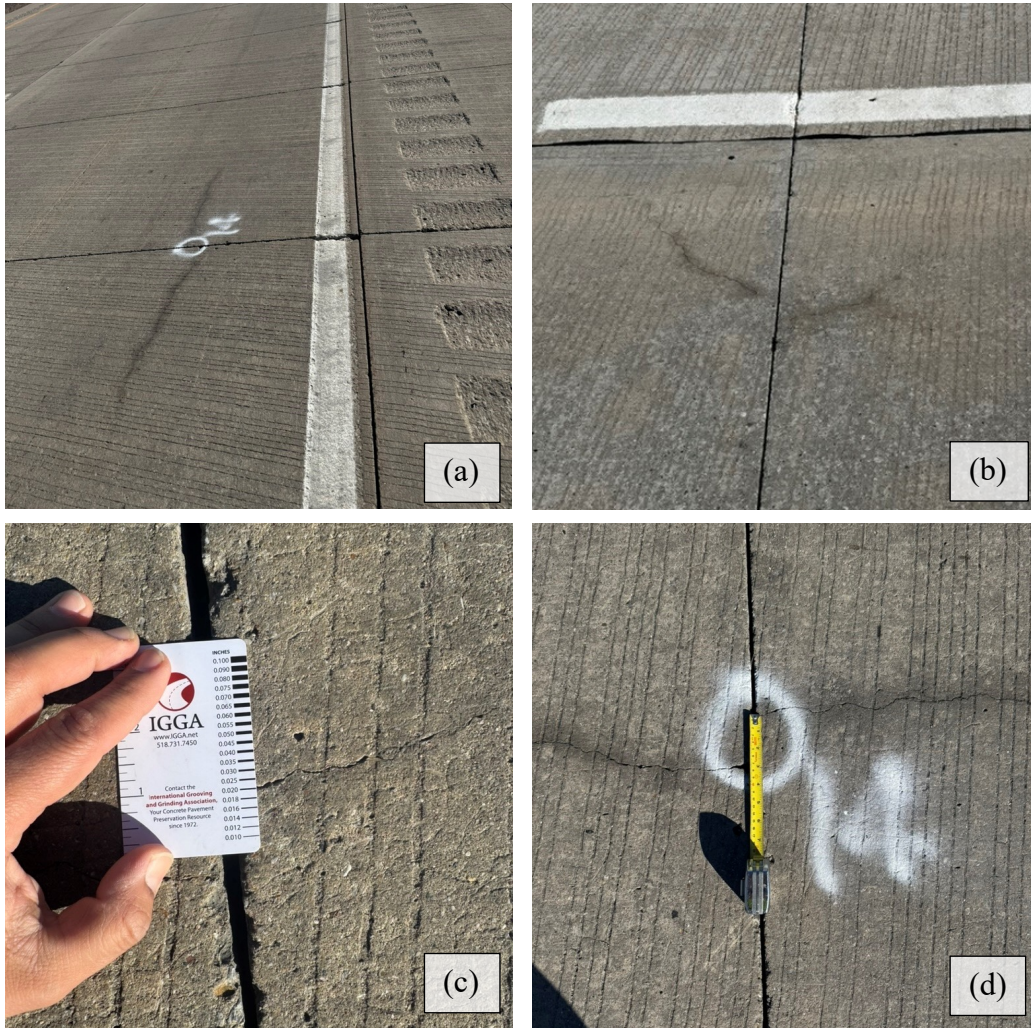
Photo. Types of distresses in driving lane: (a) longitudinal cracks in wheel paths, (b) corner break, (c) typical longitudinal crack width measurement, and (d) discontinuity of longitudinal cracks across a transverse joint.
